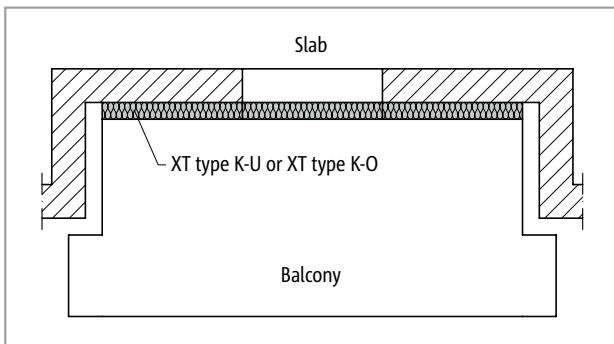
Schöck Isokorb® XT type K-U/K-O: Balcony with facade offset
